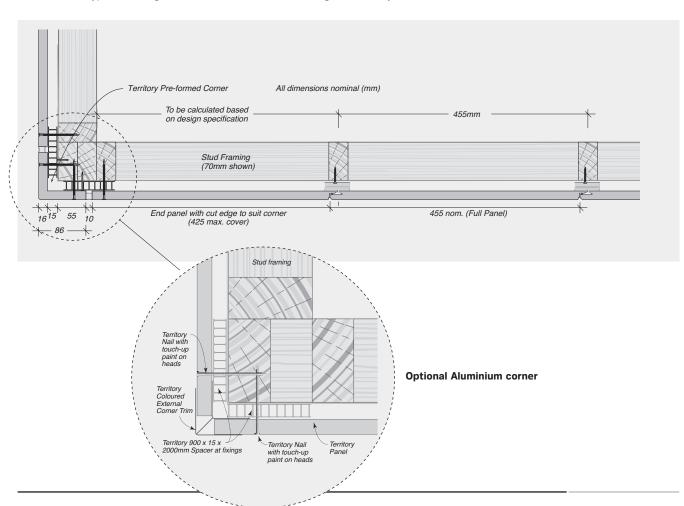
Typical Territory System Cross Section - Elevation
